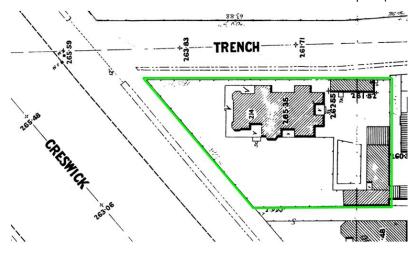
214 Creswick Road (property outlined in green), showing the house and outbuildings, 1922. (Ballarat Sewerage Authority, Detail Plan No. 2 with annotations)
